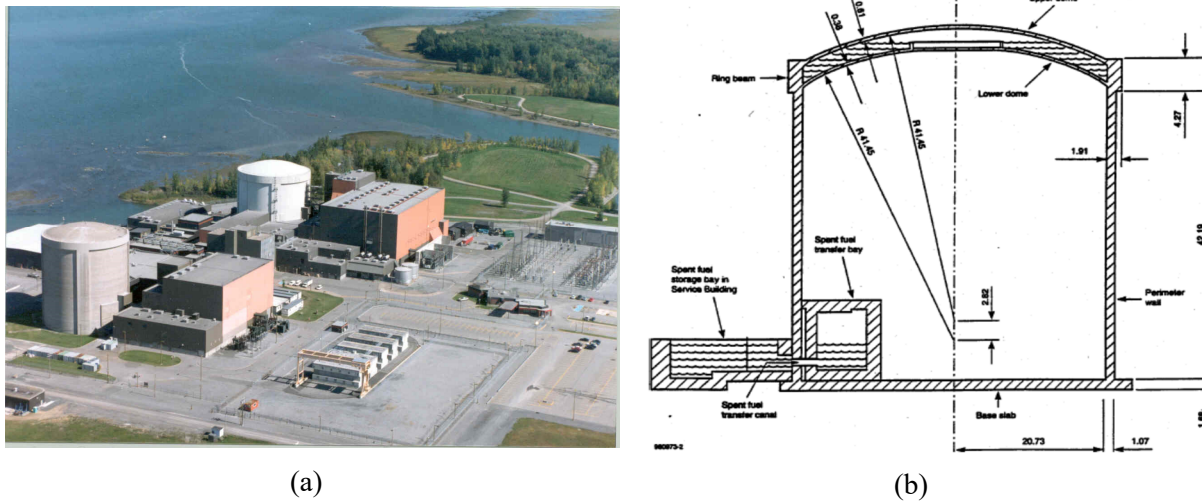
Containment building: (a) aerial view of the generating station, (b) containment structure
